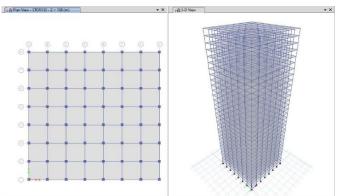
ETABS plan and 3D view of Regular RCC and composite structure
